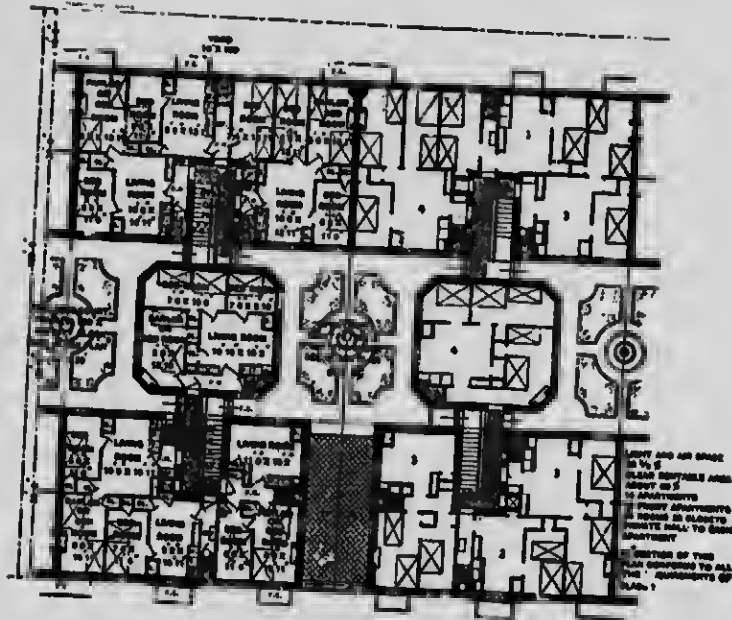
R. Thomas Short's Prize Plan for a Model Tenement House.
